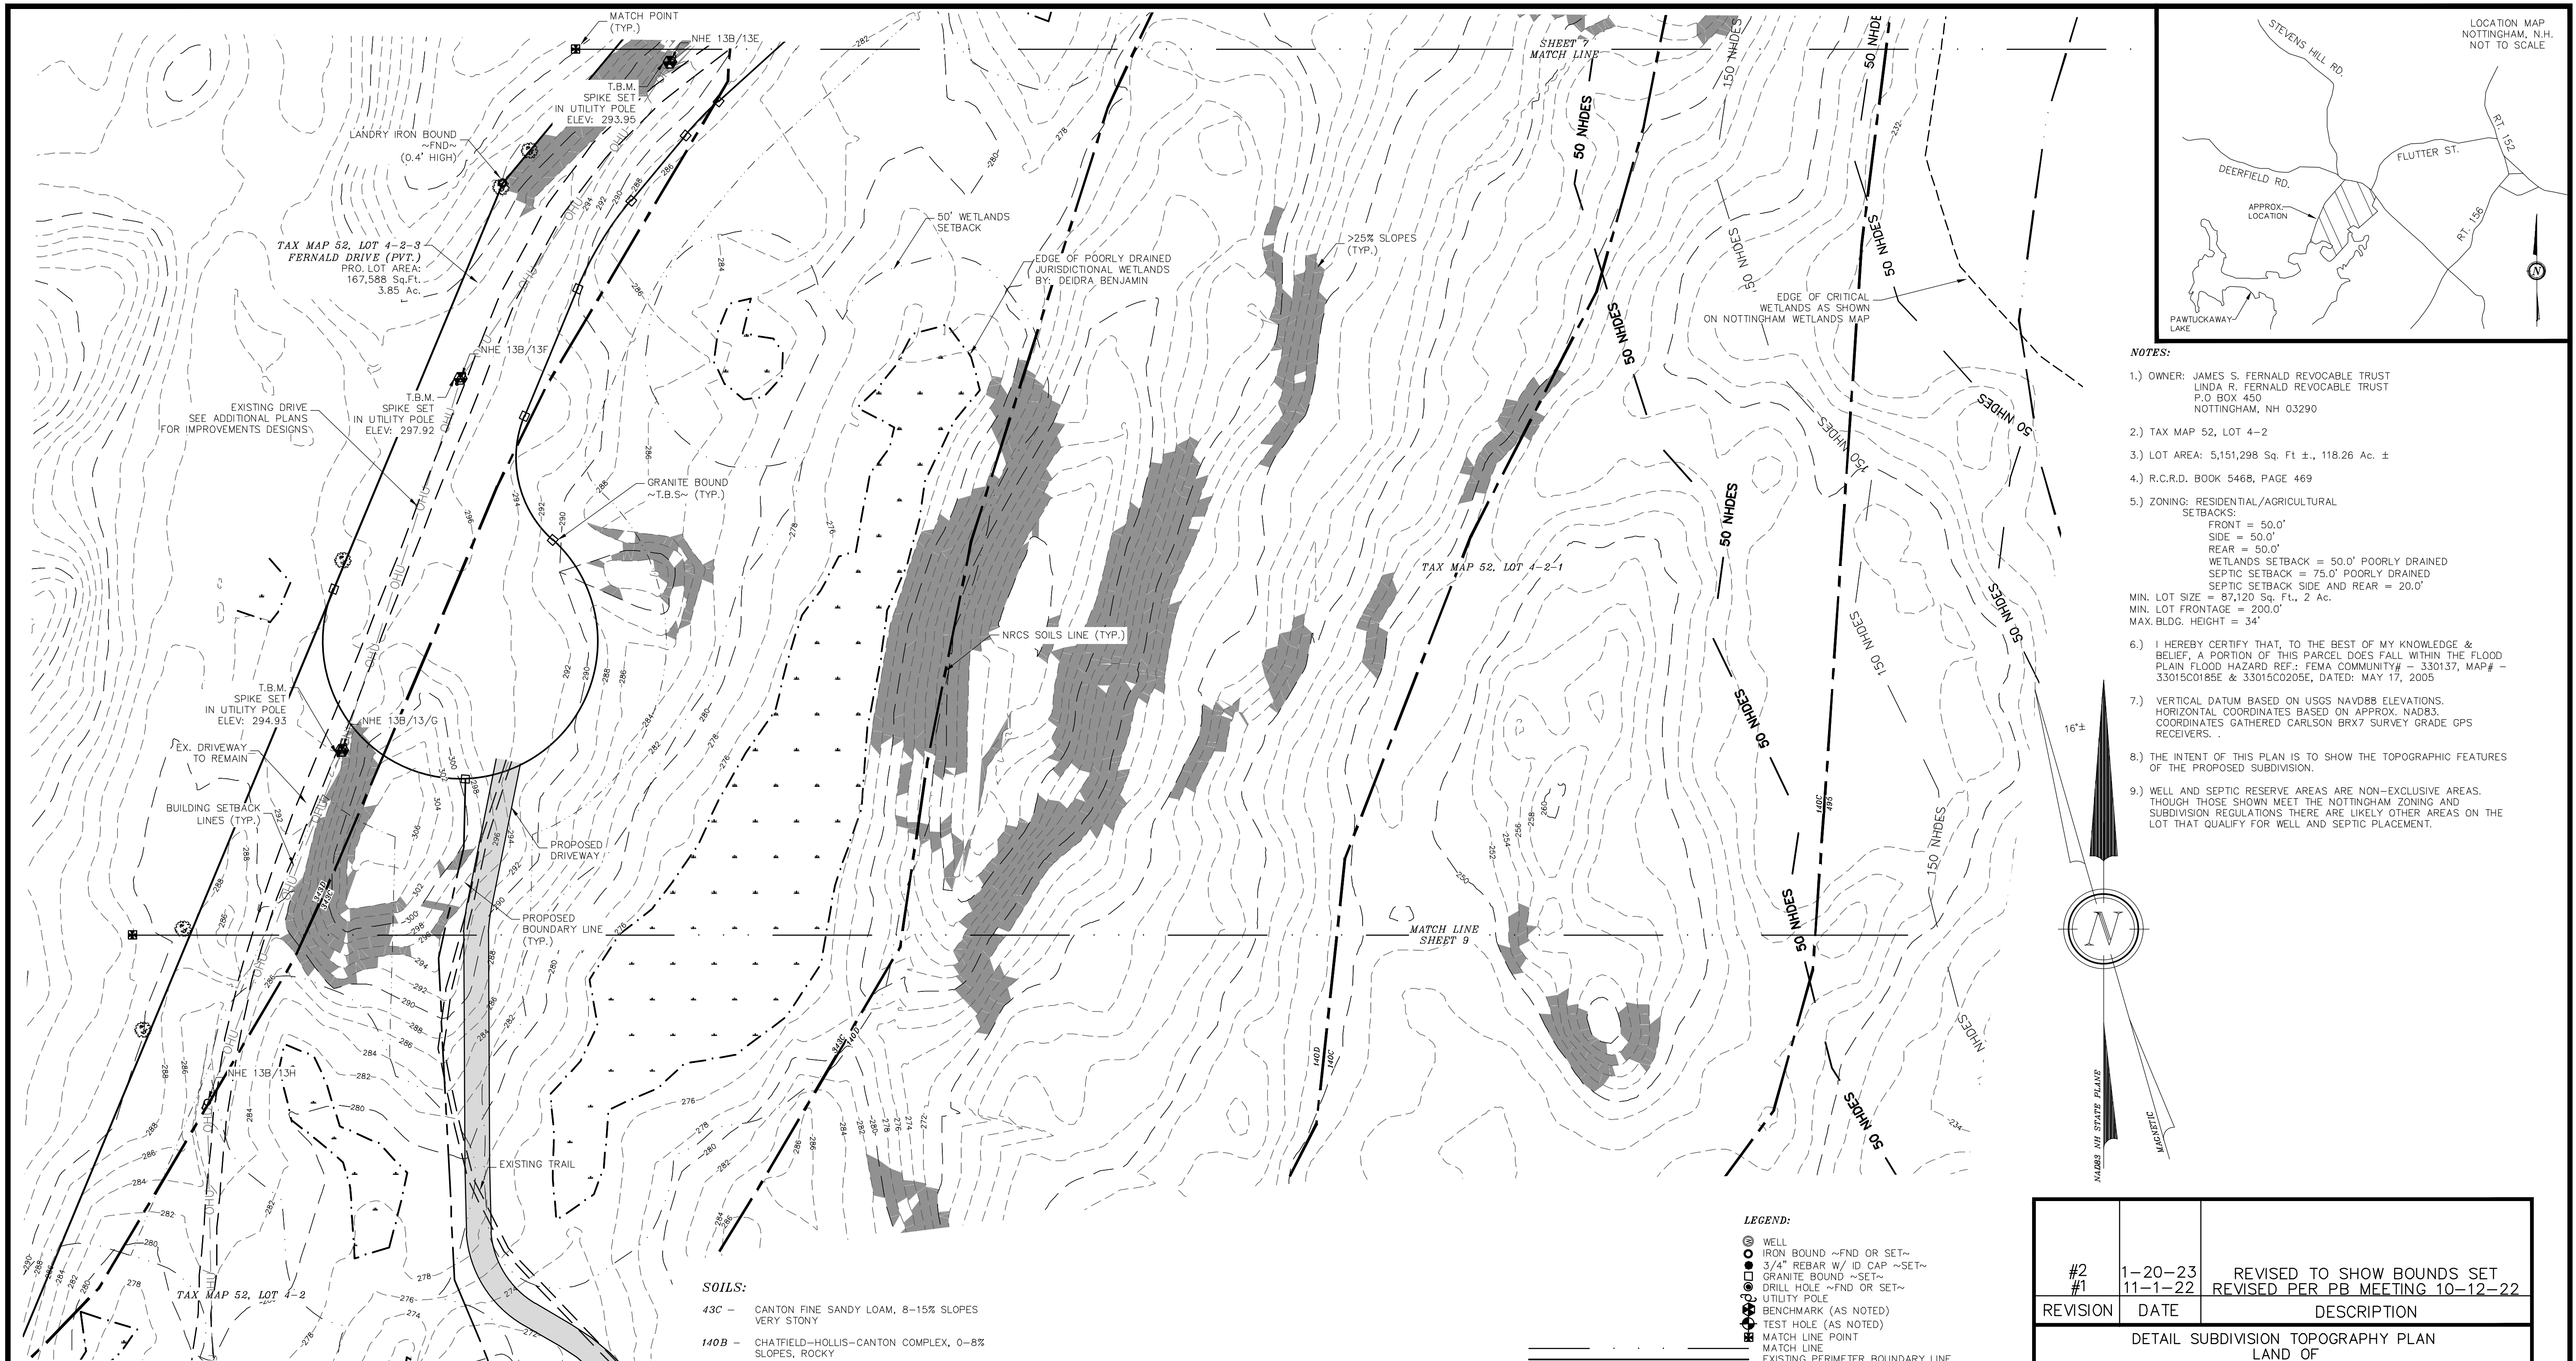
DETAIL SUBDIVISION TOPOGRAPHY PLAN
